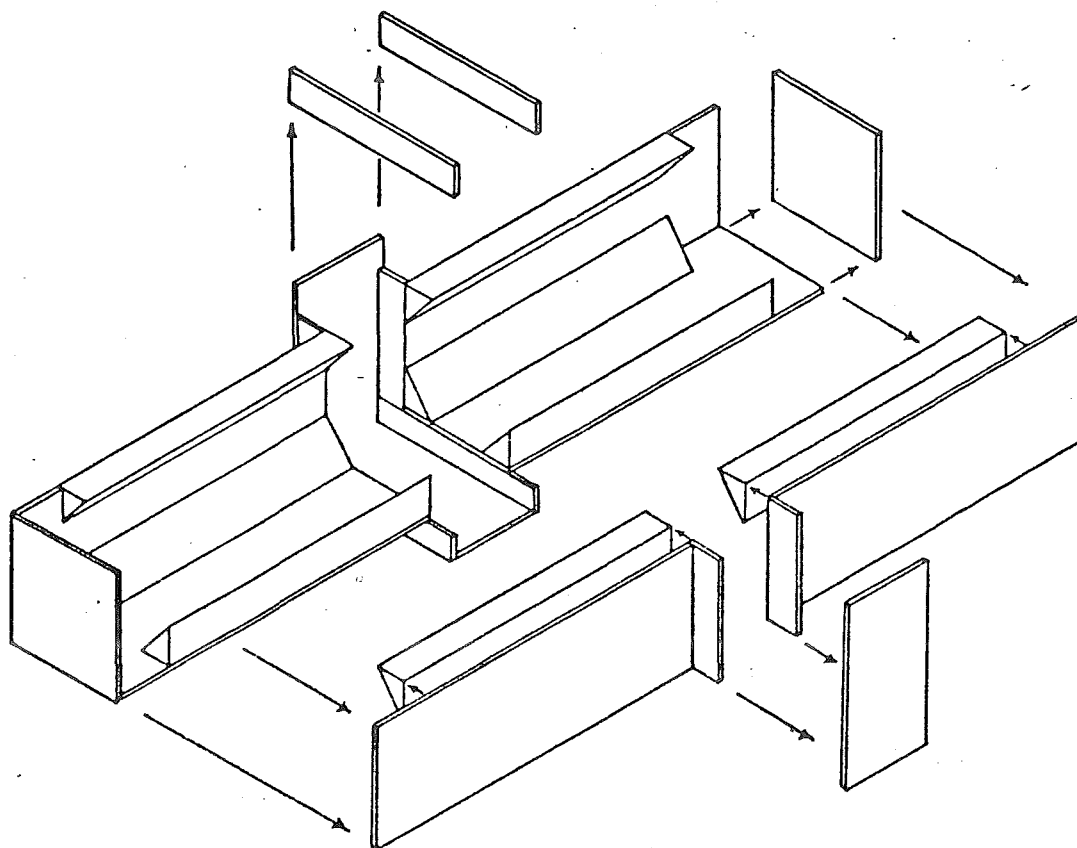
OCTAGONAL MOULD CONSTRUCTION
